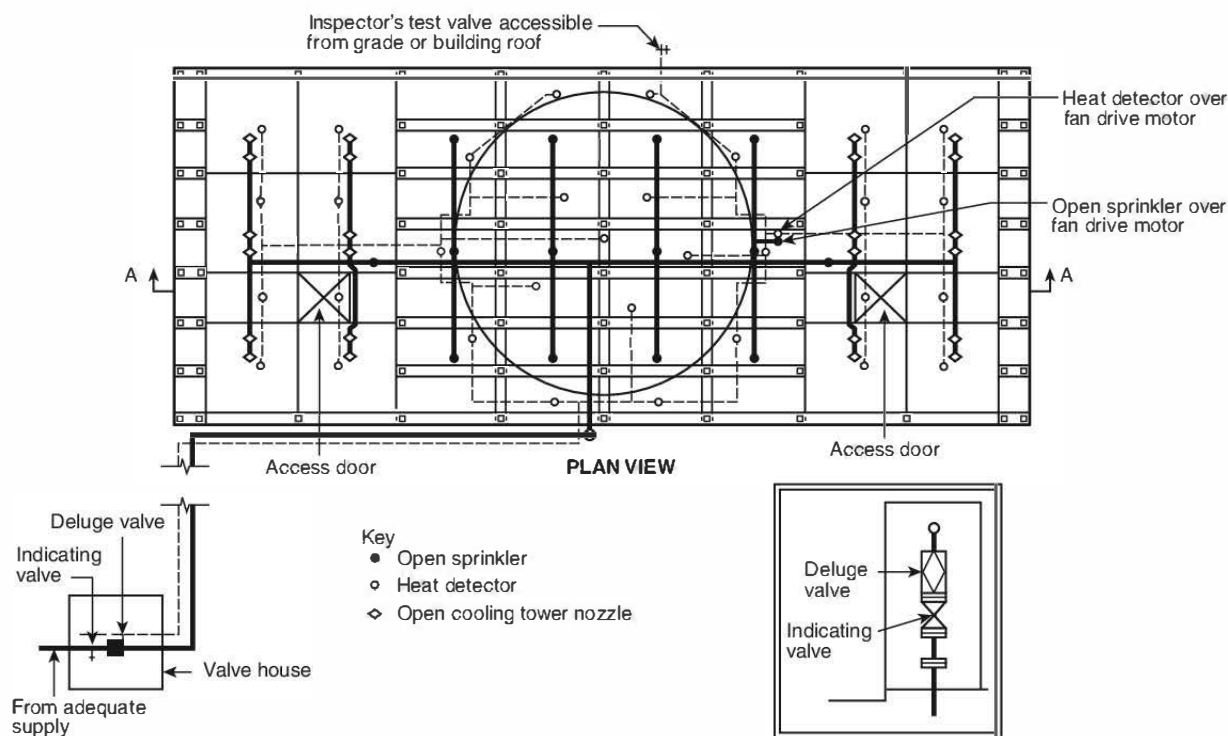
(a) Plan View, Typical Deluge Fire Protection Arrangement for Crossflow Towers with Completely Enclosed Distribution Basins.
